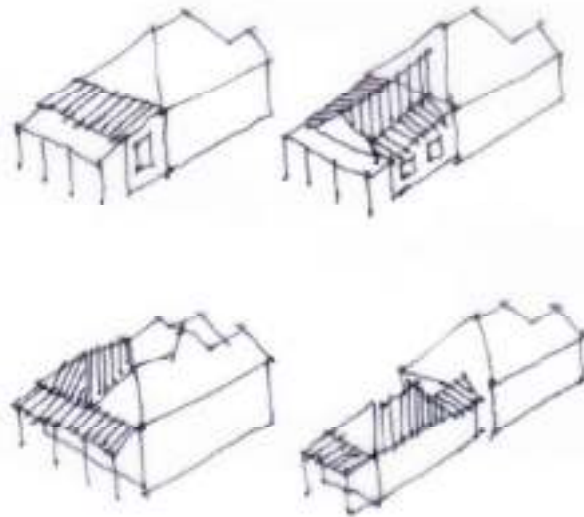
Reflecting the character of traditional building should include interpreting without replication, typical design characteristics and details.
